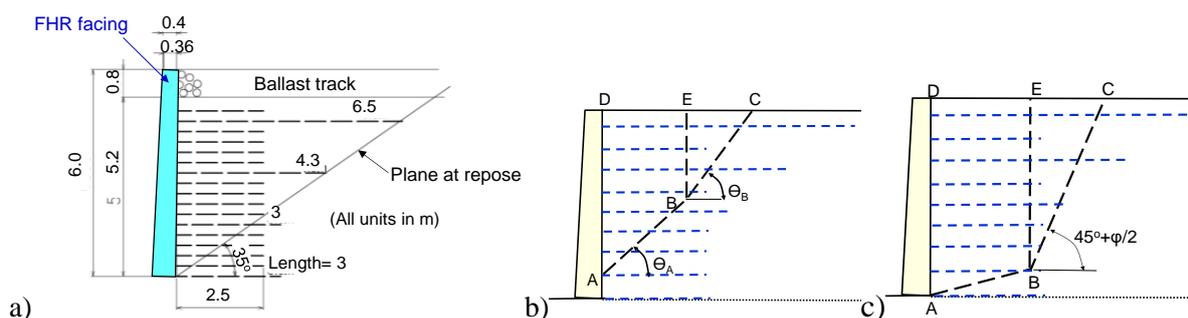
a) Typical GRS RW with FHR facing designed following the current design code; and two-wedge stability analysis: b) general; and c) most likely critical failure planes when the facing is FHR.
